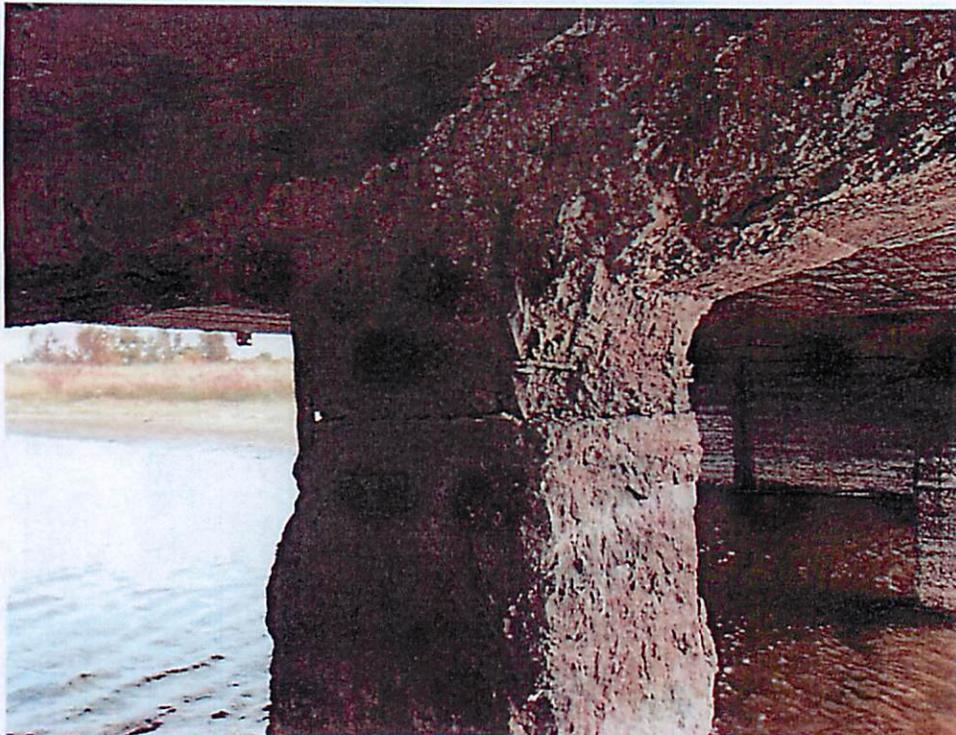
exposed reinforcing & deteriorated concrete at all columns & pier cap connections.
